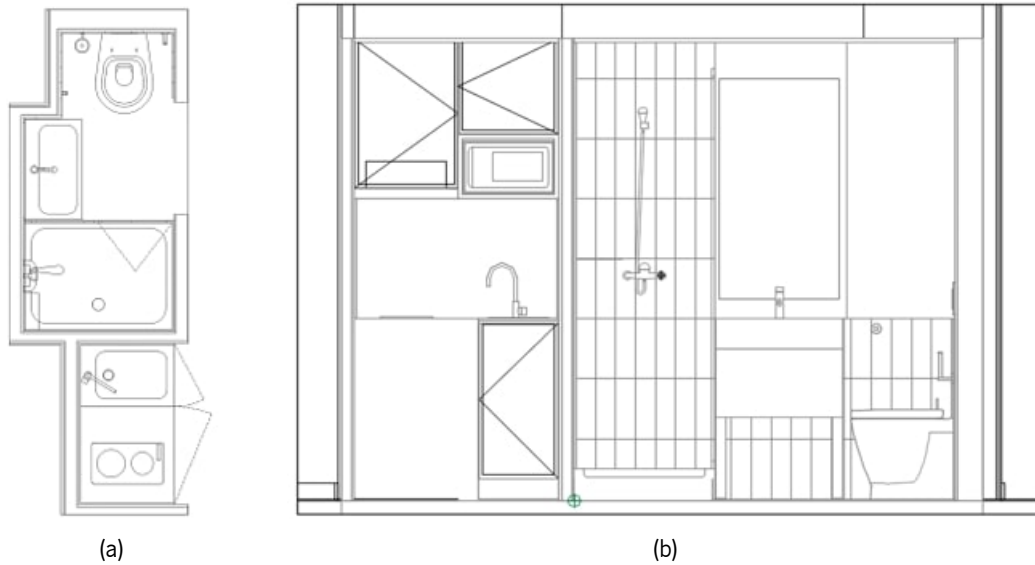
Technical drawings of the proposed module in (a) top and (b) side view.
